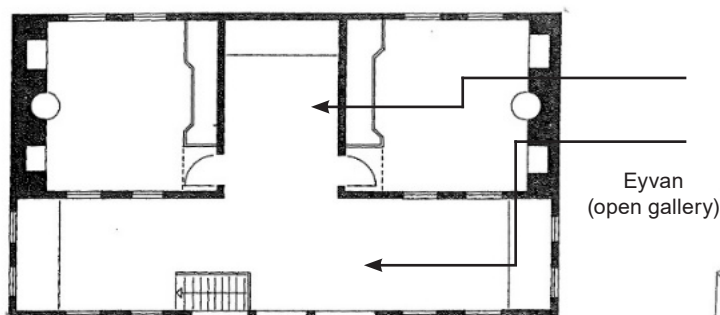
Halil Agha house in Mudanya (Bursa Province), a typical Hayat layout
